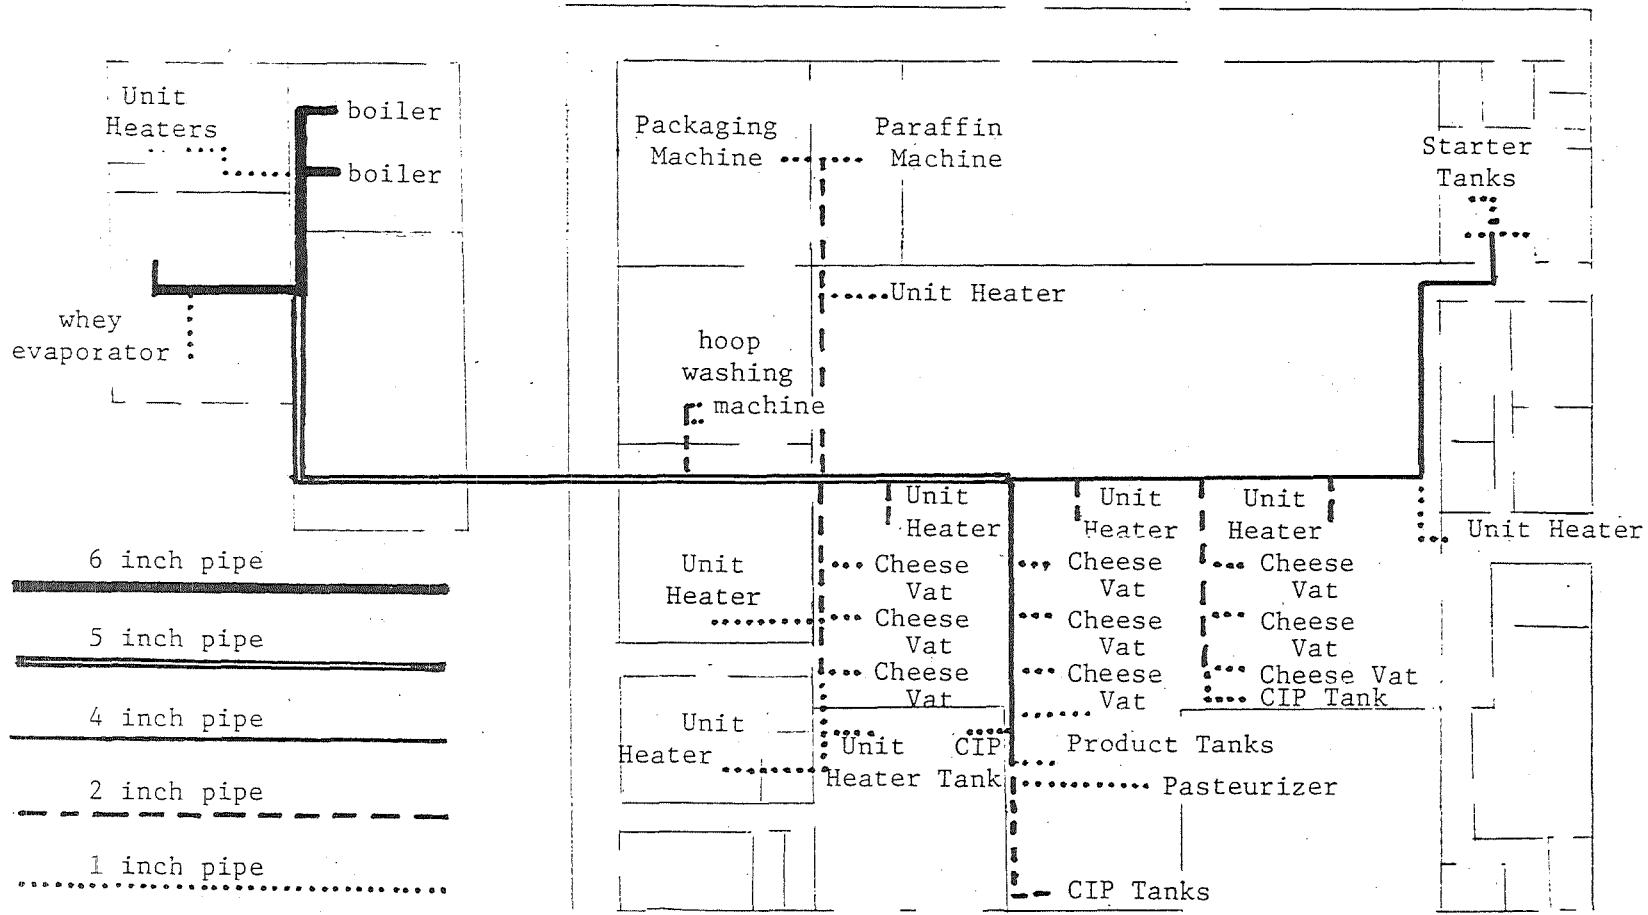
Steam pipe layout in a cheddar cheese plant.
